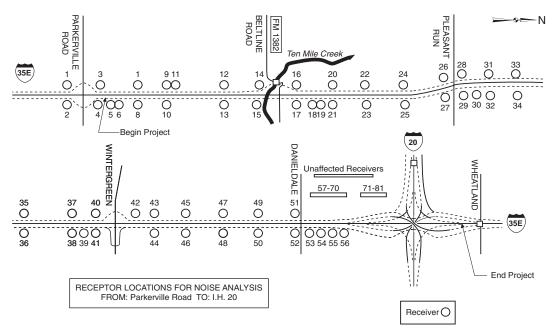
Drawing of noise analysis of a proposed widening of IH-35E from Parkerville Road to IH-20 in Dallas County, Dallas District
